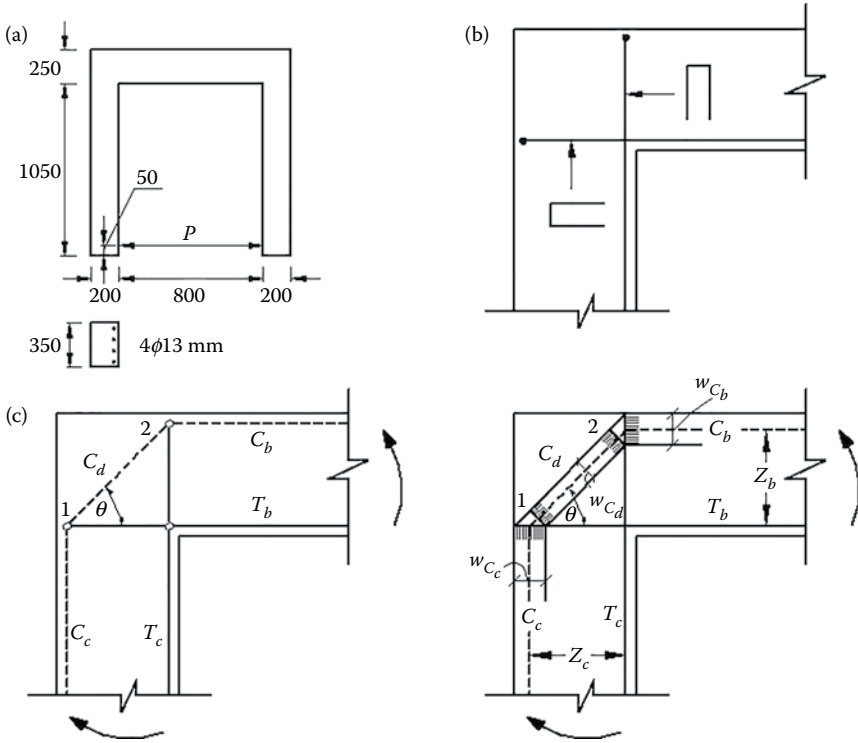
Example 7.1—corner subjected to an opening moment (a) test specimen, (b) reinforcement details, and (c) the *STM* details.
